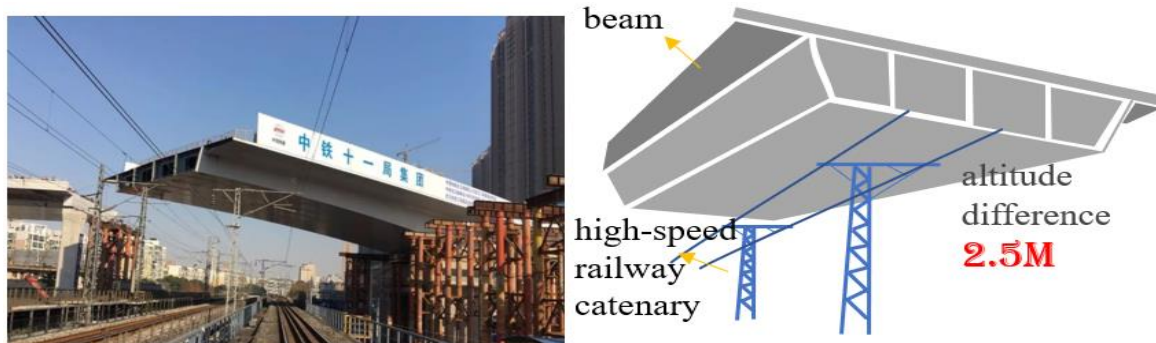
Wuhan Changqing Road main line swivel bridge
